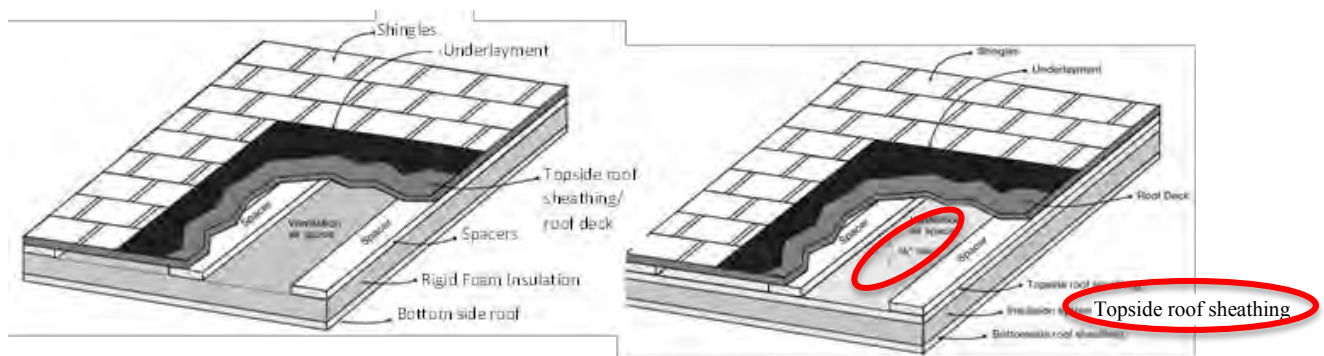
Ventilation for Asphalt Shingles (ARMA Form No. 211-RR-94 2008)
